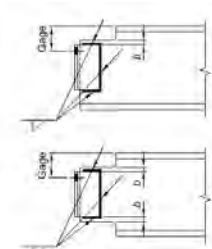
Illustration of shelf dimension for fillet welds.
